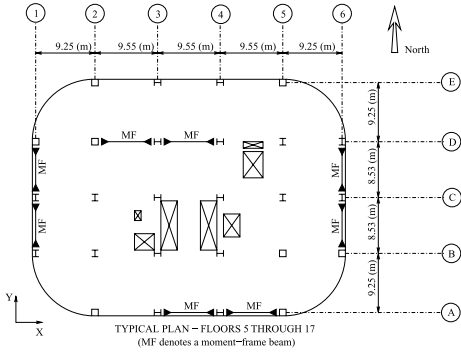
Typical plan for Building 1. Lines marked with 'MF' indicate moment-frame bays.
